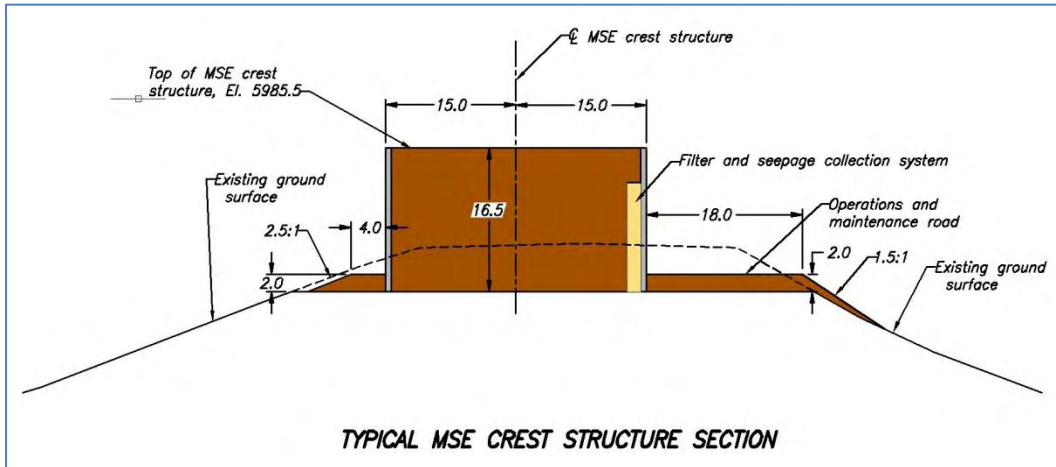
Preferred Alternative, MSE wall – section view.
